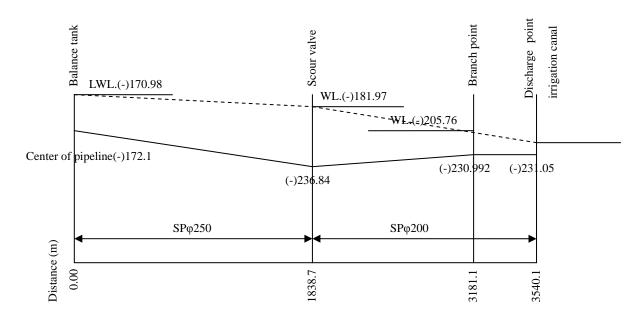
Hydraulic vertical plan of Jericho No.1 to irrigation canal
